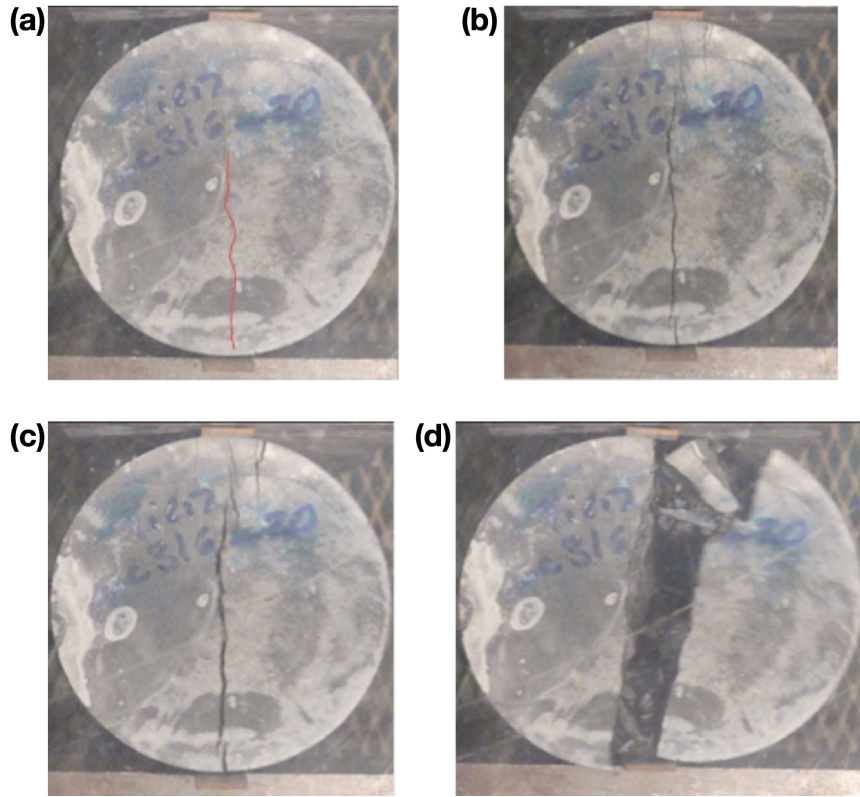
Example tension splitting crack propagation in plain concrete from high-speed camera: (a) crack initiation (highlighted in red for clarity); (b) fully formed crack (c) at failure; (d) post fracture.
